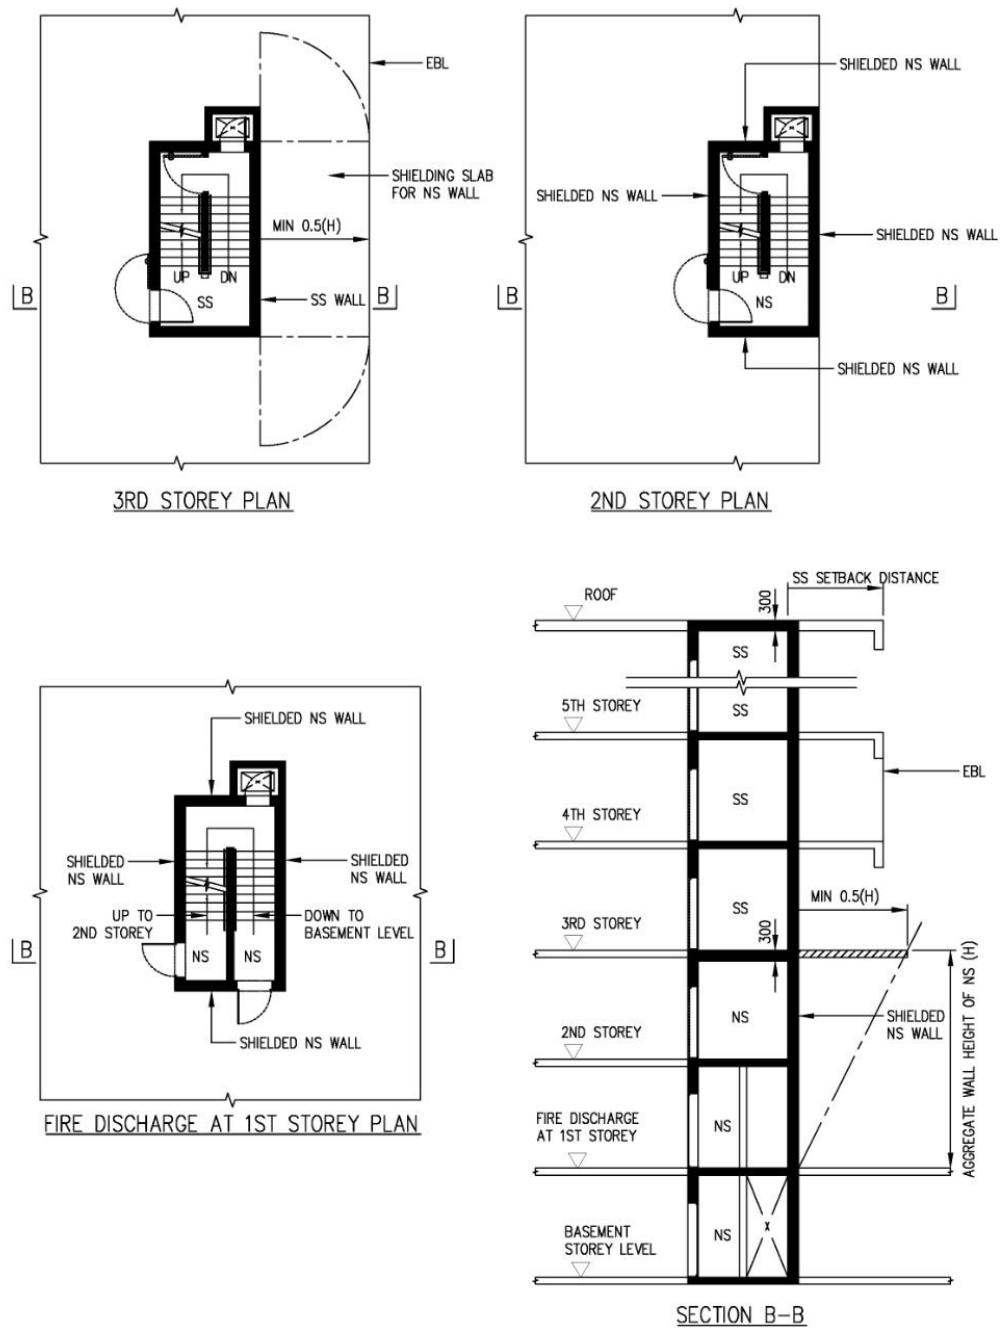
C : SHIELDED NS WALLS OF S/C SS TOWER
